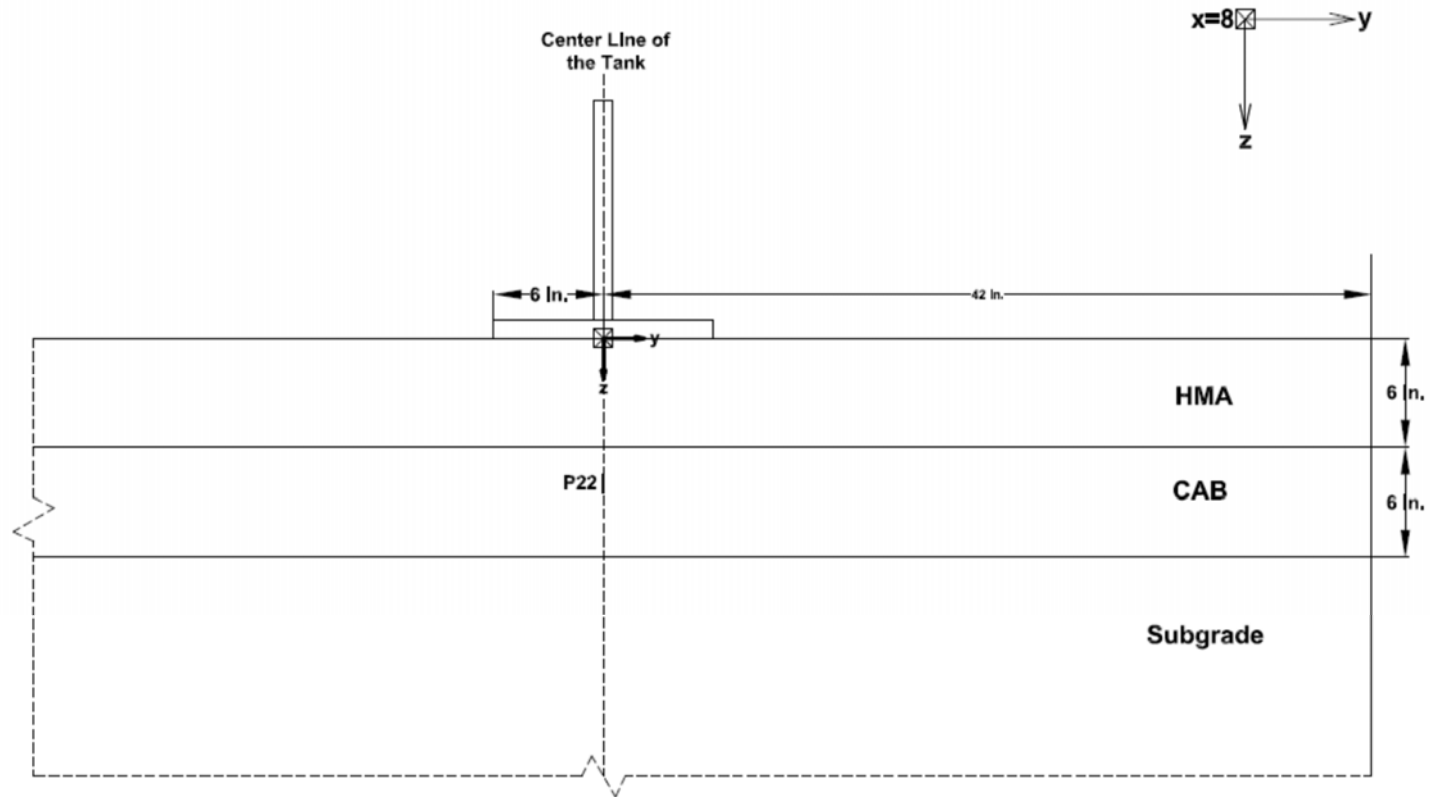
Instrumentation plan for experiment No. 1—Profile view, X = 8 inches
